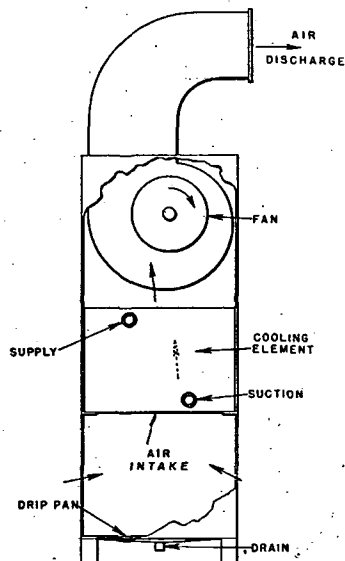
FLOOR MOUNTED SURFACE TYPE COOLING UNIT WITH DISTRIBUTING OUTLETS
